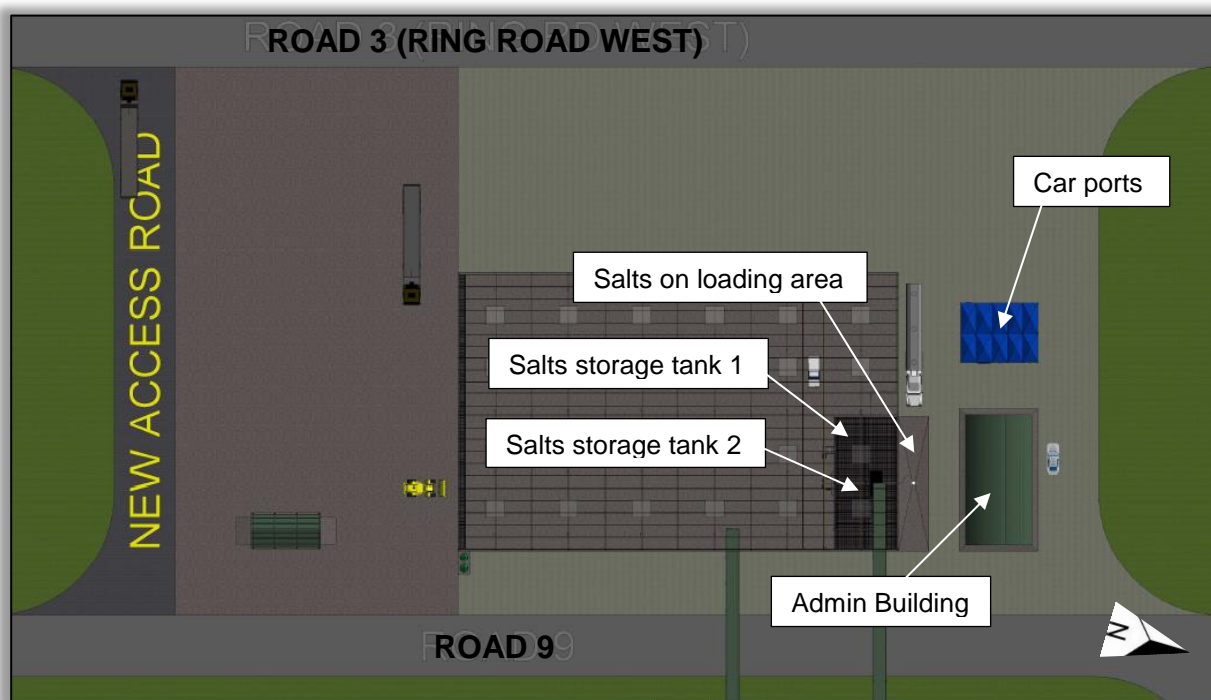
Layout of waste handling and storage facility – Salts Option 1
